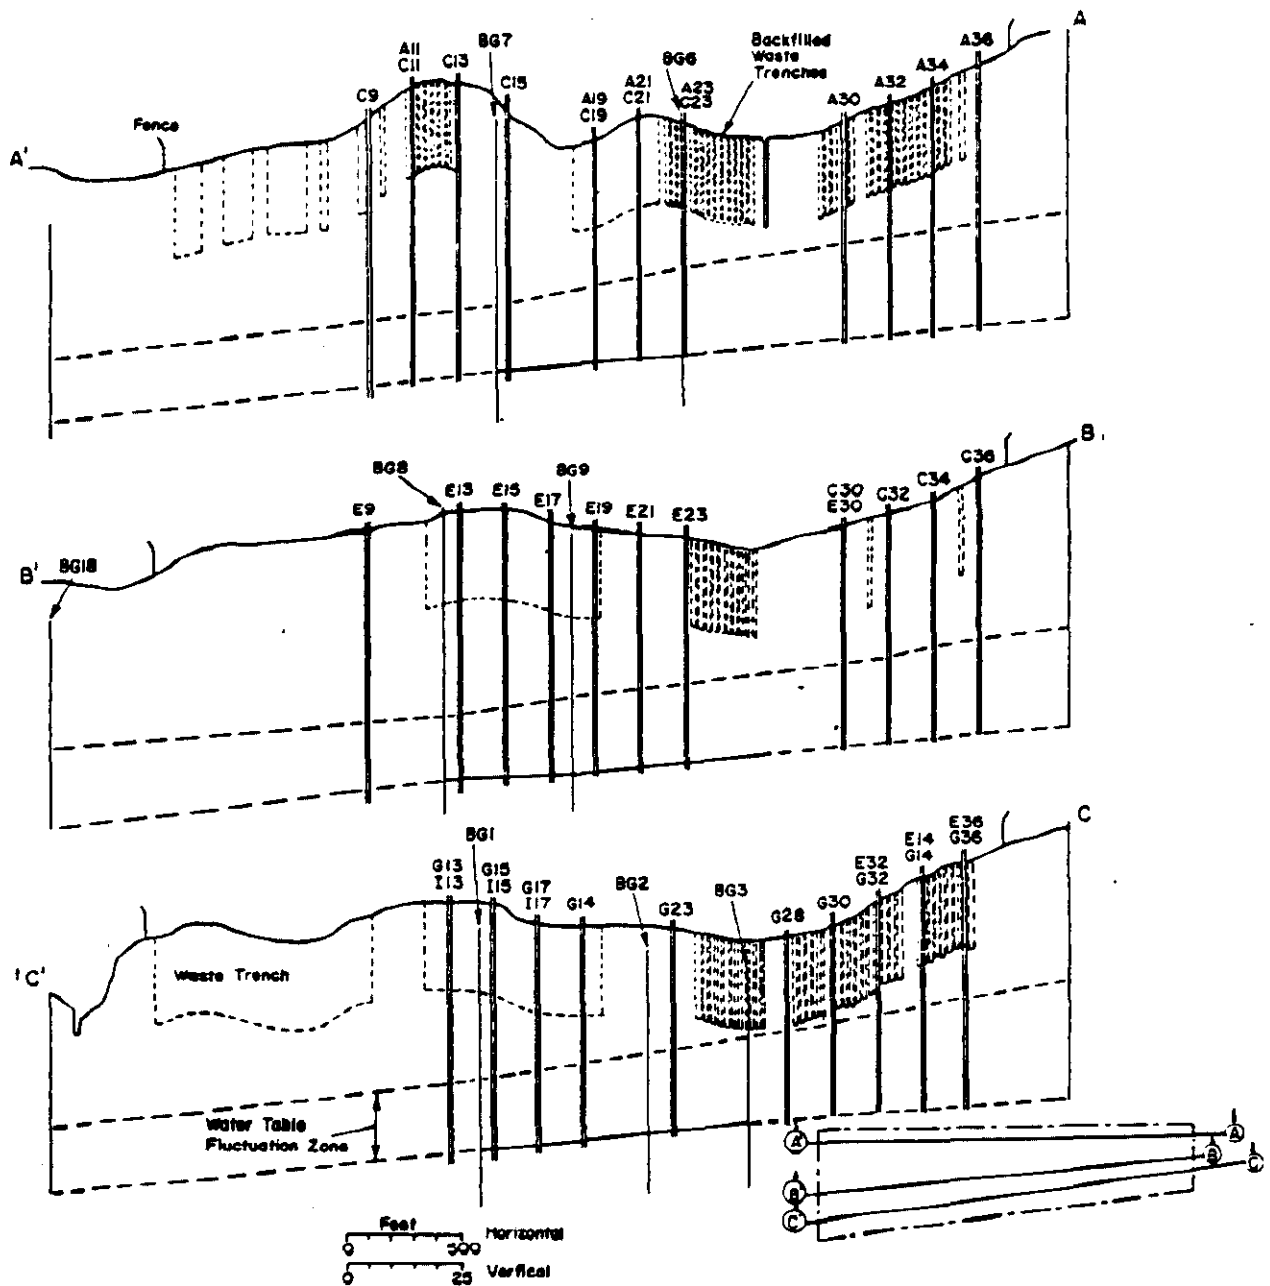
Burial Ground Cross Sections Showing Details of Water Table Well Construction (Ref 8).
